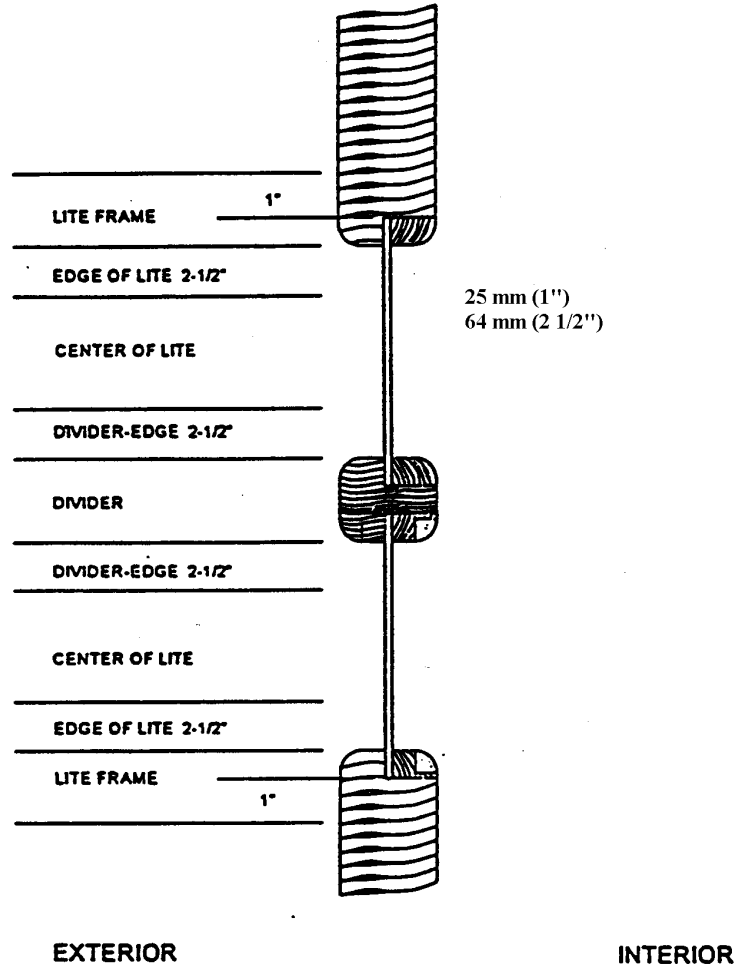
EXTERIOR WOOD DOOR SYSTEM AREA SCHEMATIC, VERTICAL SECTION.
